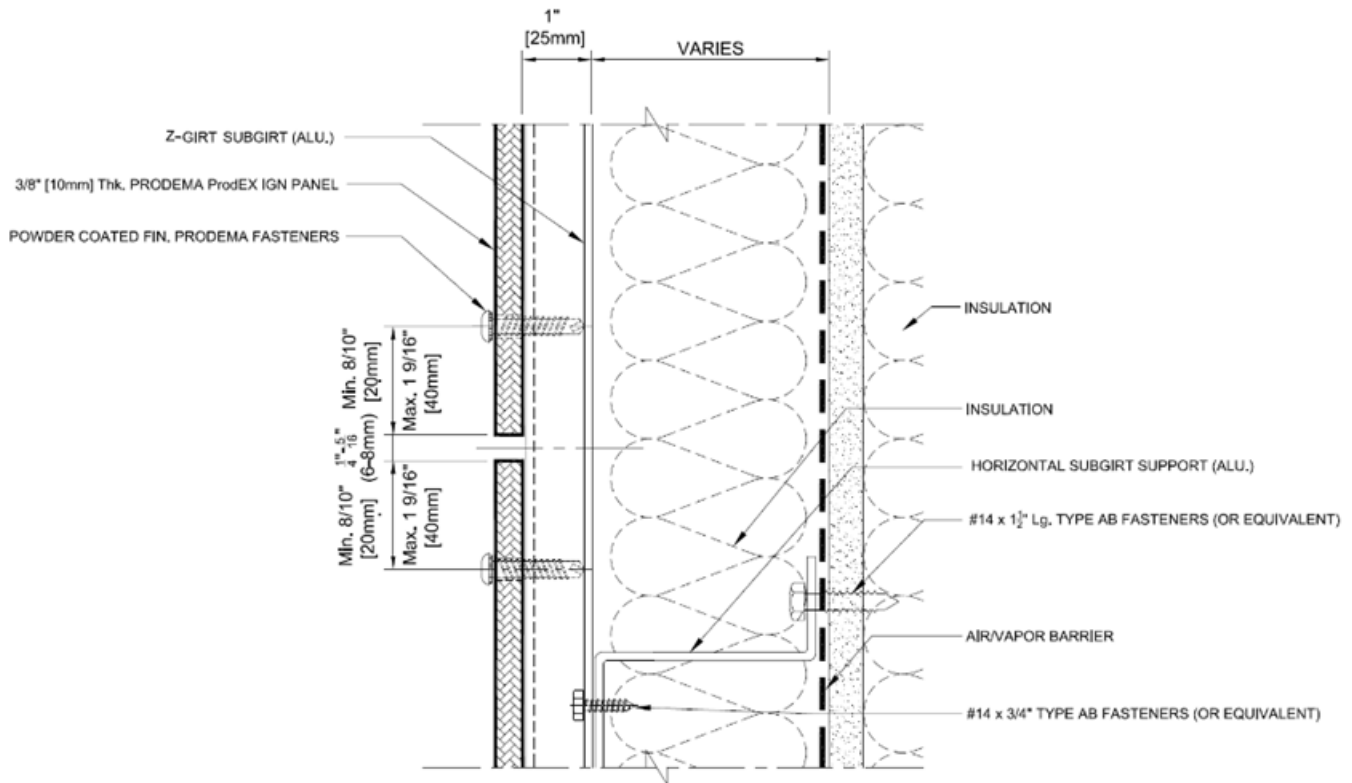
PRODEX IGN WALL PANEL CLADDING EXPOSED FASTENER SYSTEM DETAILS
